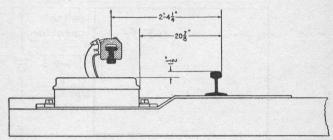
Diagram Showing Clearance between Top of Model 4 Switch Machine and Contacting Surface of Third Rail. Electric Division, N. Y. C. & H. R. R. R.
